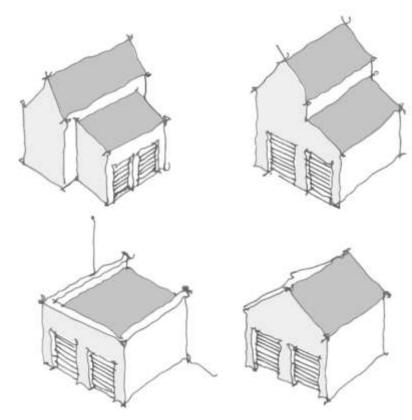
\_Diagram illustrating acceptable garage buildings. Garages integrated into the design of the main building are encouraged as the erf sizes lend themselves to connected rather than free standing structures
